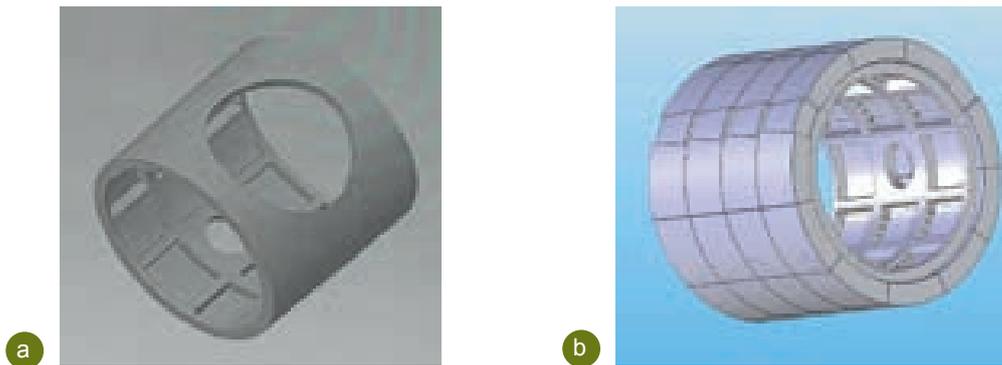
(a) The steel reinforcement ring; (b) the reinforcement ring as placed inside the lining of the Connecting gallery.
